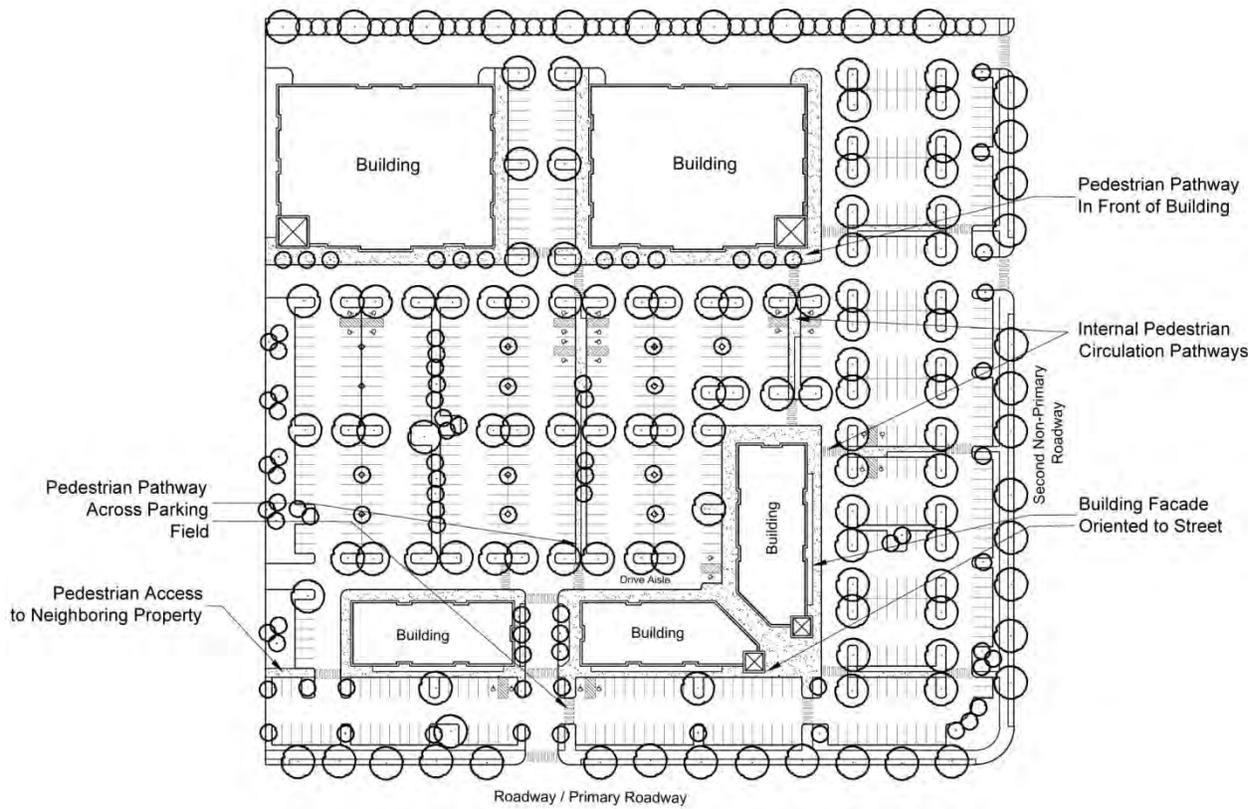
(d). – Site Layout - Pedestrian Standards
